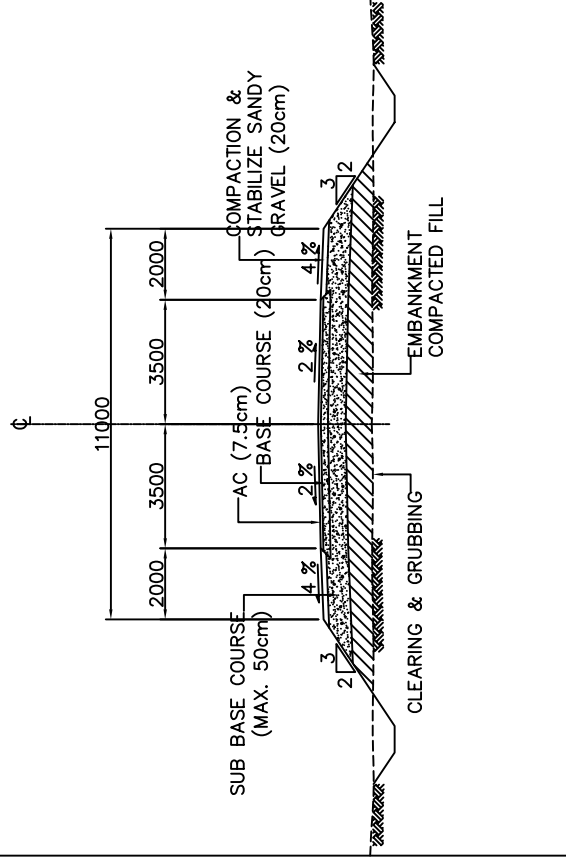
(2/5) TYPICAL CROSS SECTIONS
